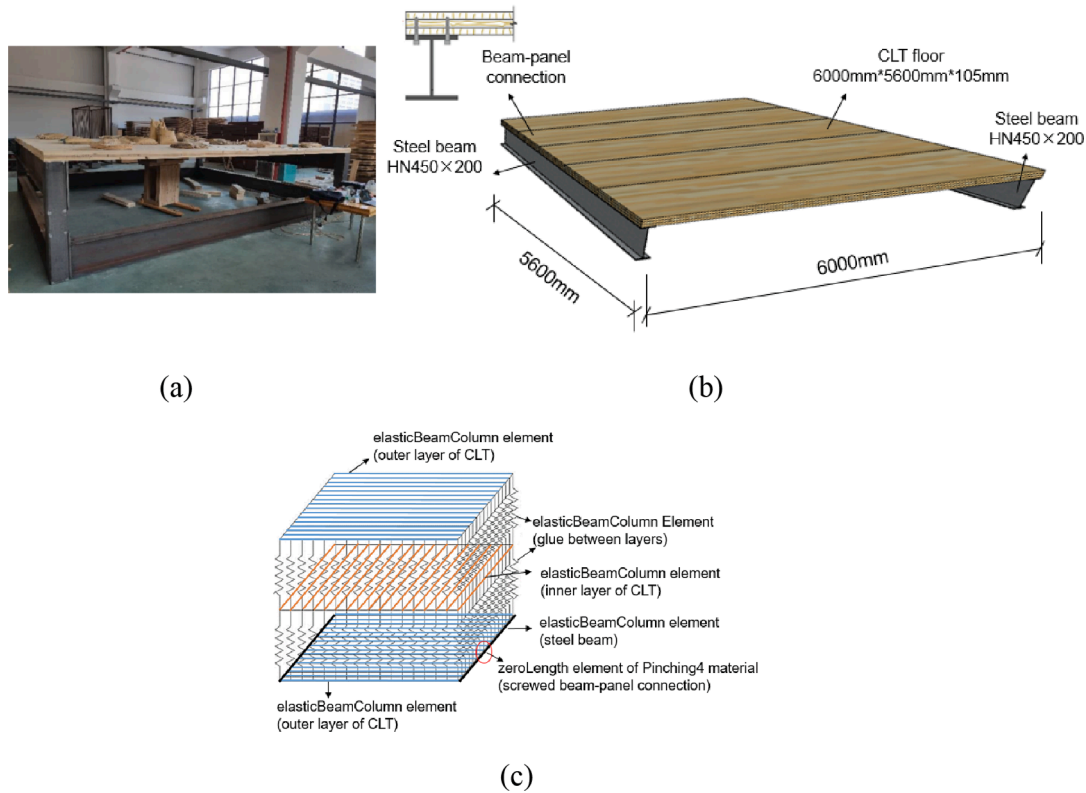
(a) CLT floor used in laboratory tests [22]; (b) Schematic of the floor; (c) Schematic of the floor modelled in OpenSees [23].
